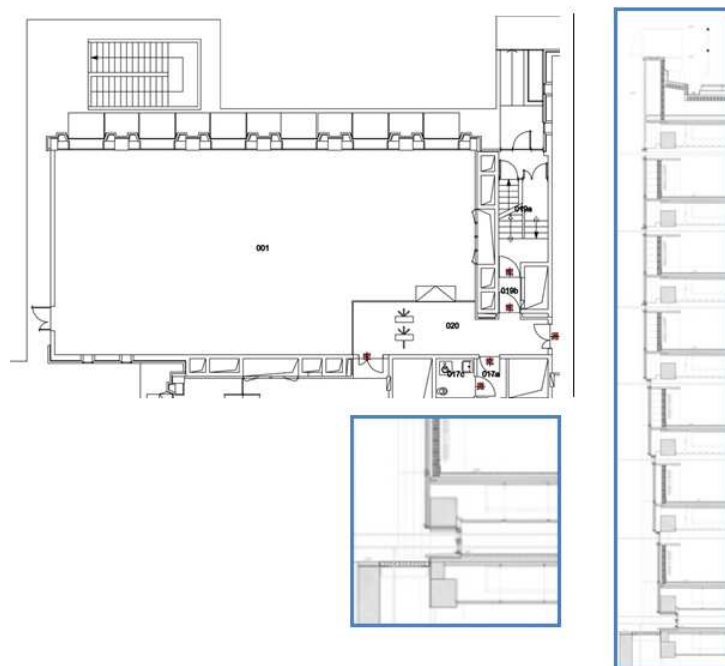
A Plan and a Vertical Section of the Polimi Test Façade Building (Cad Drawing) used for the thematic assessment to support the insulating evaluation of the Building
